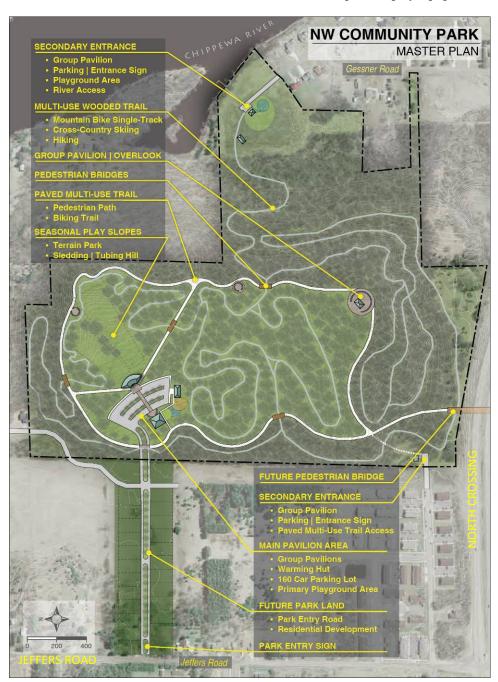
Preliminary Plan for Northwest Community Park (North is to the left.)
